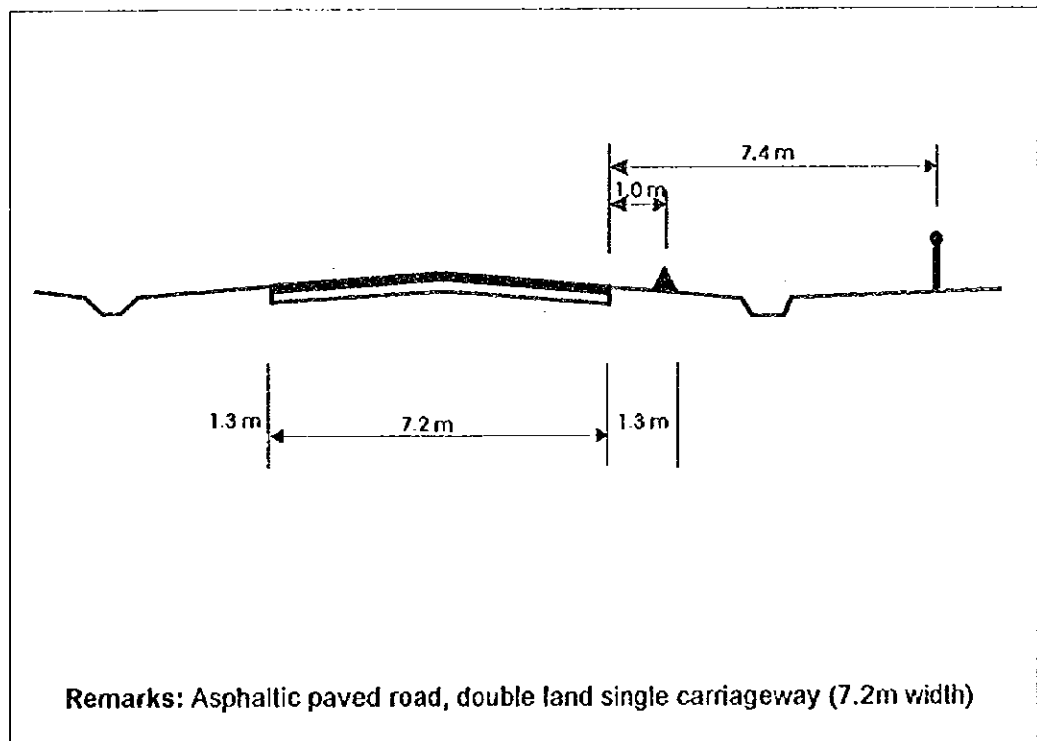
Road profile at station A2 along New Bagamoyo Road about 300 m south-east of the proposed disposal site
